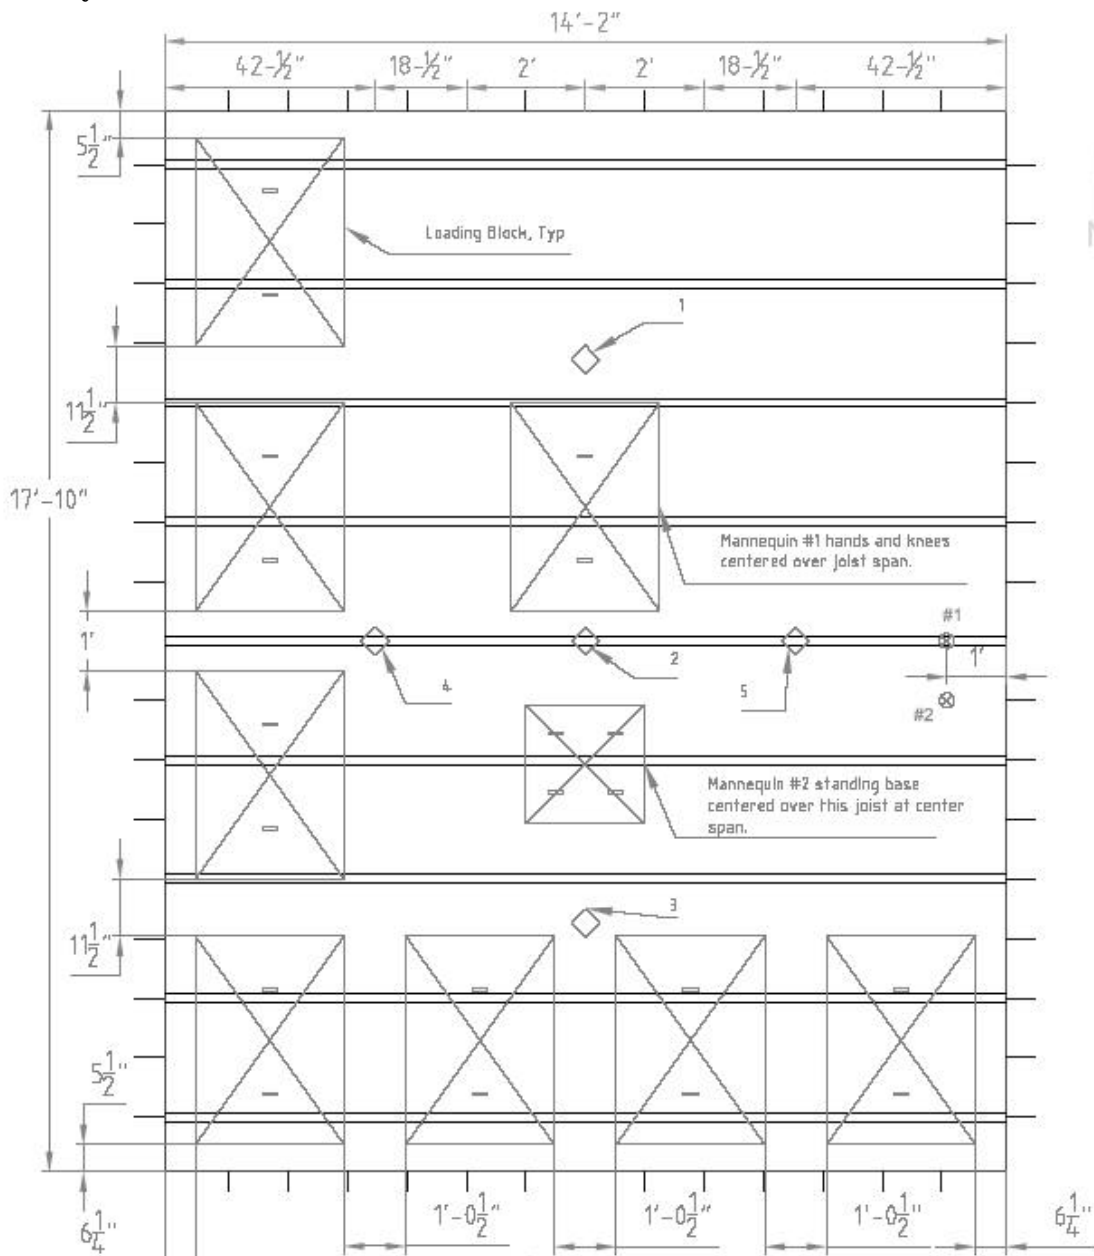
Loading and Instrumentation Layout (See Figure A.16)
